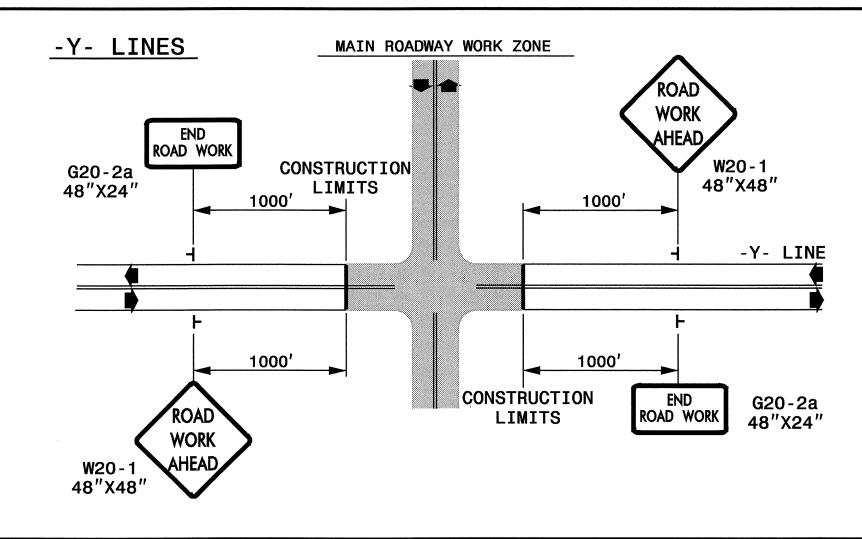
DETAIL DRAWING FOR TWO-WAY UNDIVIDED AND URBAN FREEWAYS ADVANCED WORK ZONE WARNING SIGNS
